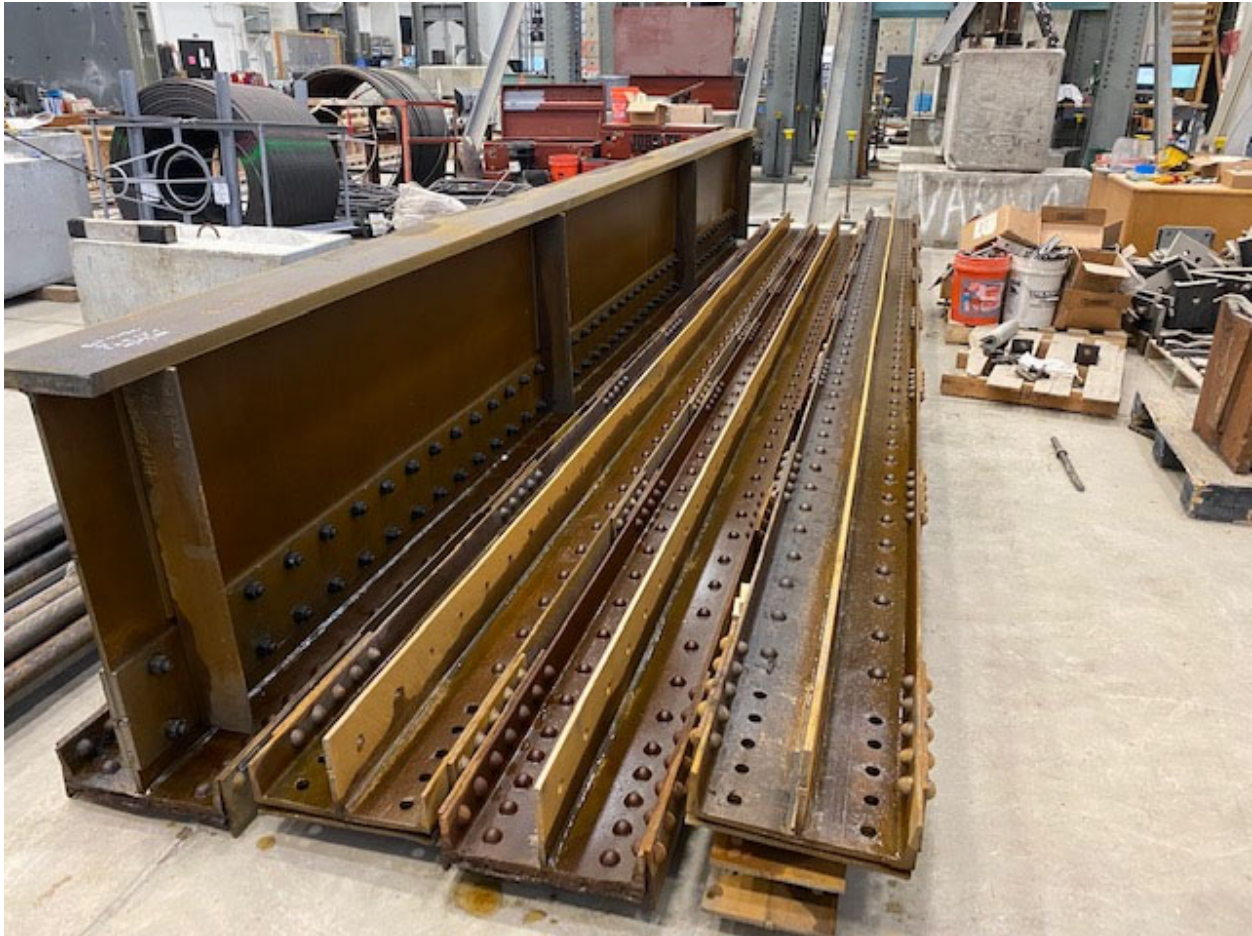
Left specimen is completed girder with lower flange that contains pack-out corrosion. The three specimens to the right are remaining lower flanges to be tested. Though not shown, an additional web and top flange was fabricated so that two tests can run simultaneously.
